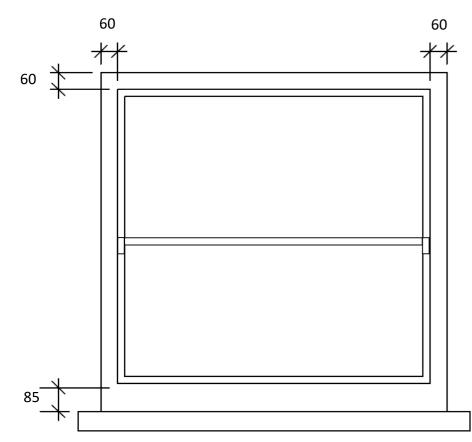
Replacement of existing unsympathetic thick set glass bricks. Proposed timber framed box framed sliding sash single glazed lightwell window, with horizontal meeting rail; joinery framework to exactly match original windows in profile and dimensions.
